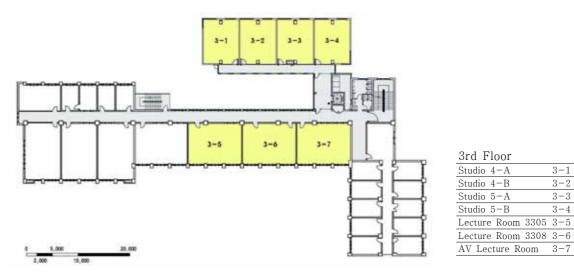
Key Plan of the ACB and the ASA: 3rd Floor
